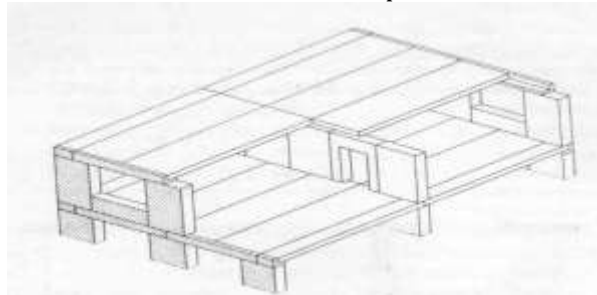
Diagrammatic view of a “classic” long wall construction in a prefabricated building
